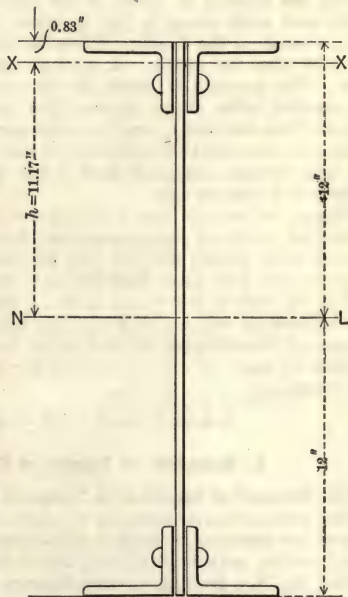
Moment of Inertia of Cross-section of Plate Girder. No Flange-plates
